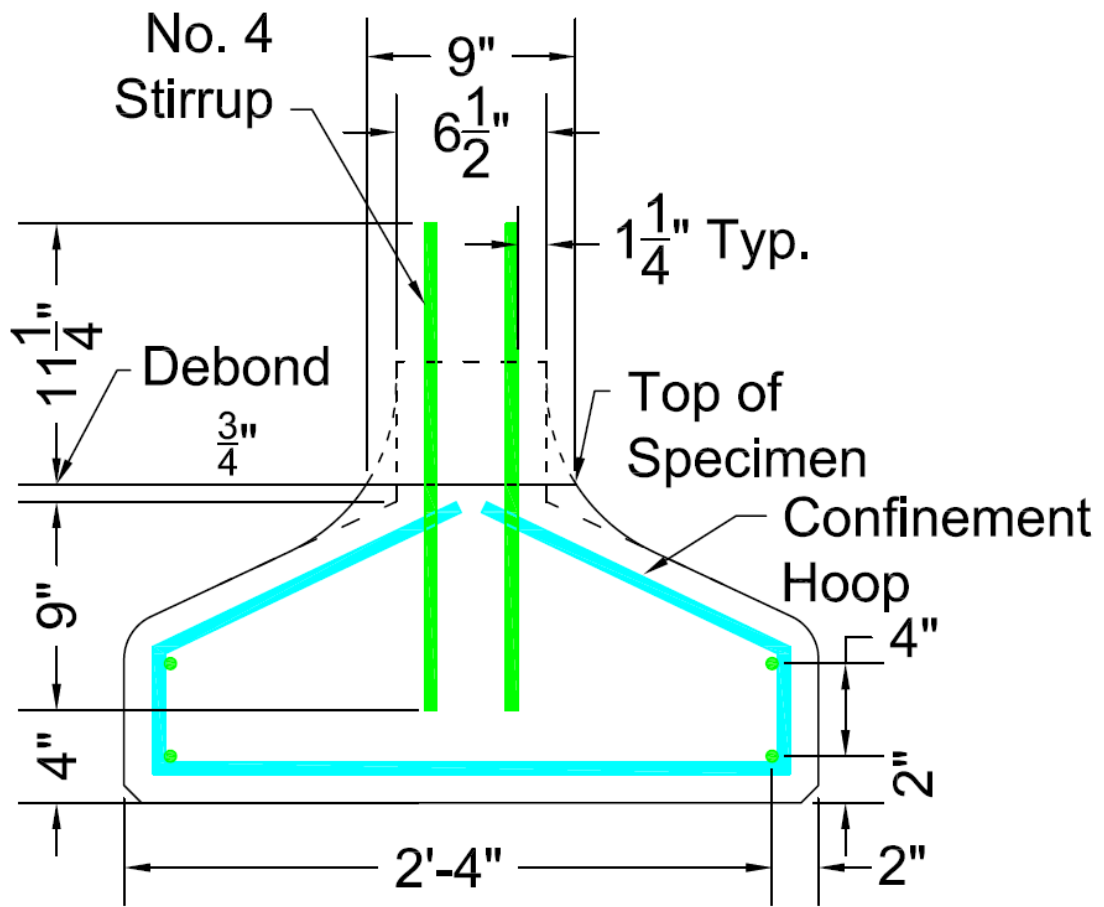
Cross-sectional view of typical MN-shaped subassembly specimen.
